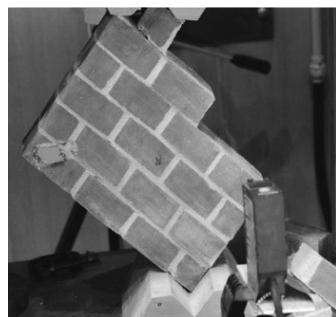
Failure Pattern of non-retrofitted masonry wallet
